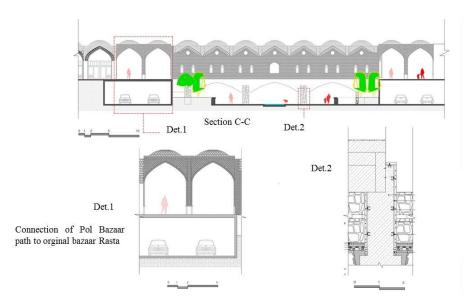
Detail of The proposed design for rebuilding Pol Bazaar (Source: Author)
